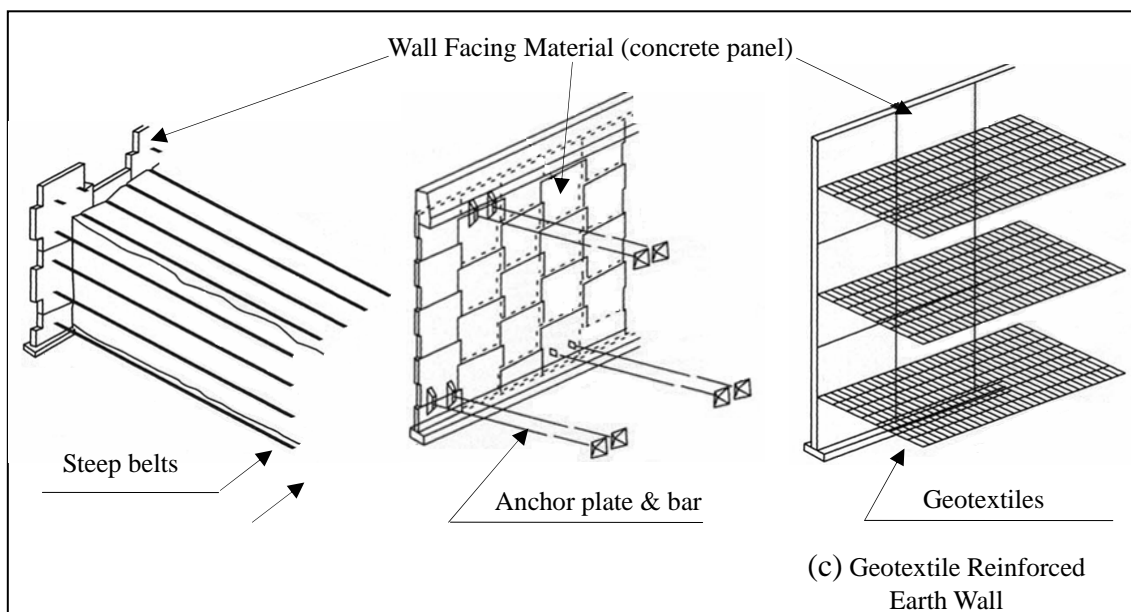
Conceptual Mechanism of Reinforced Earth Walls
